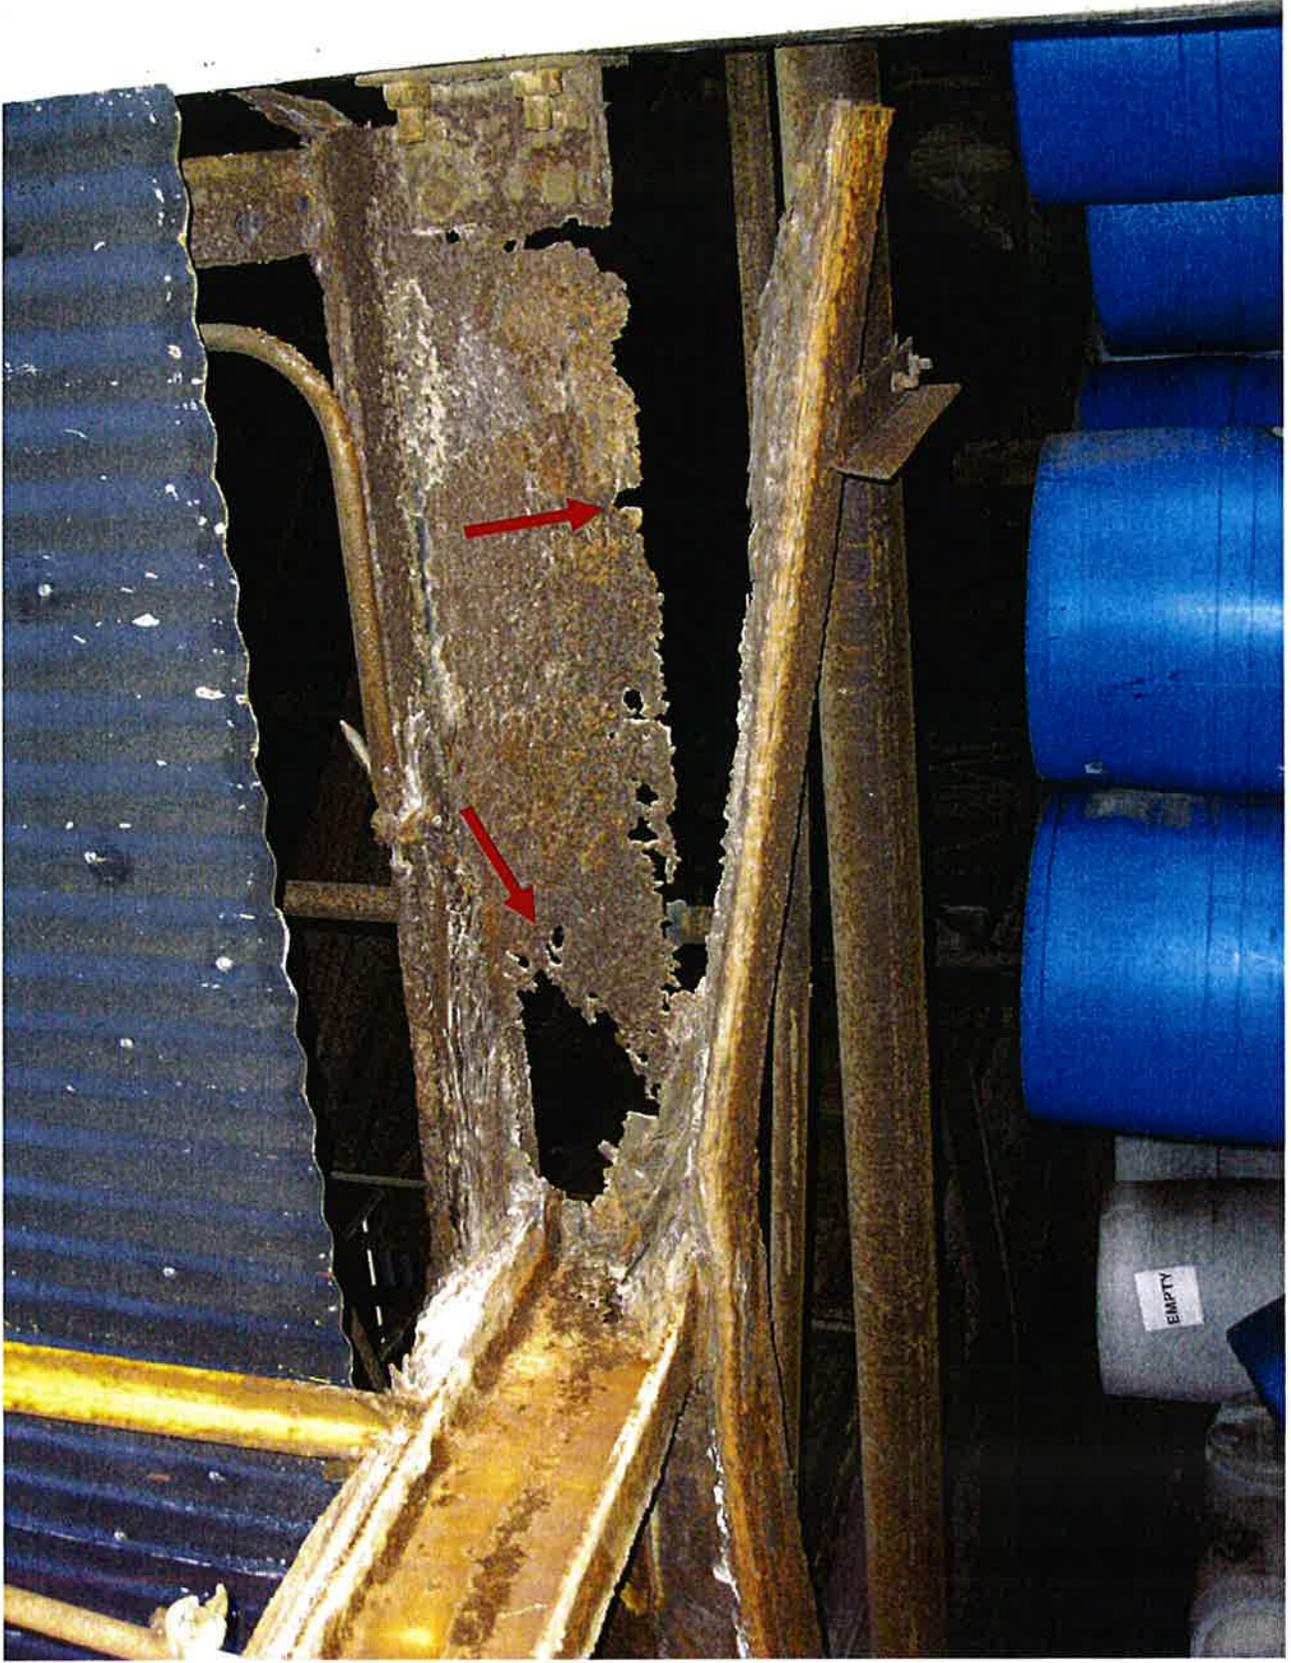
DETERIORATED BEAM AT INTERFACE BETWEEN BUILDINGS 7 AND 16
